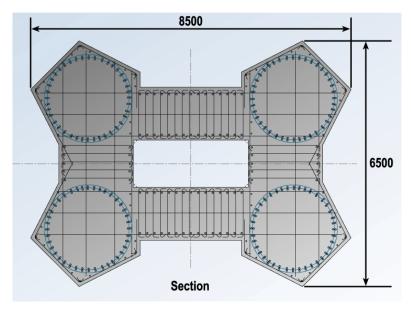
Reinforcement of Pier (San Francisco-Oakland Bay Bridge Section)
